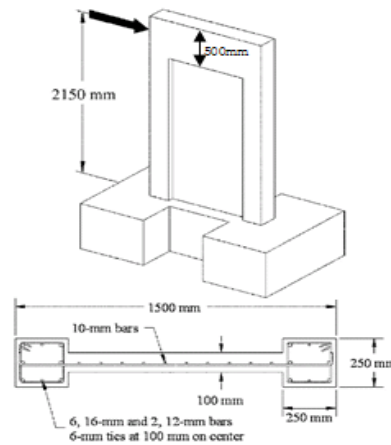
Geometry and reinforcement details of barbell-shaped section wall specimens.
